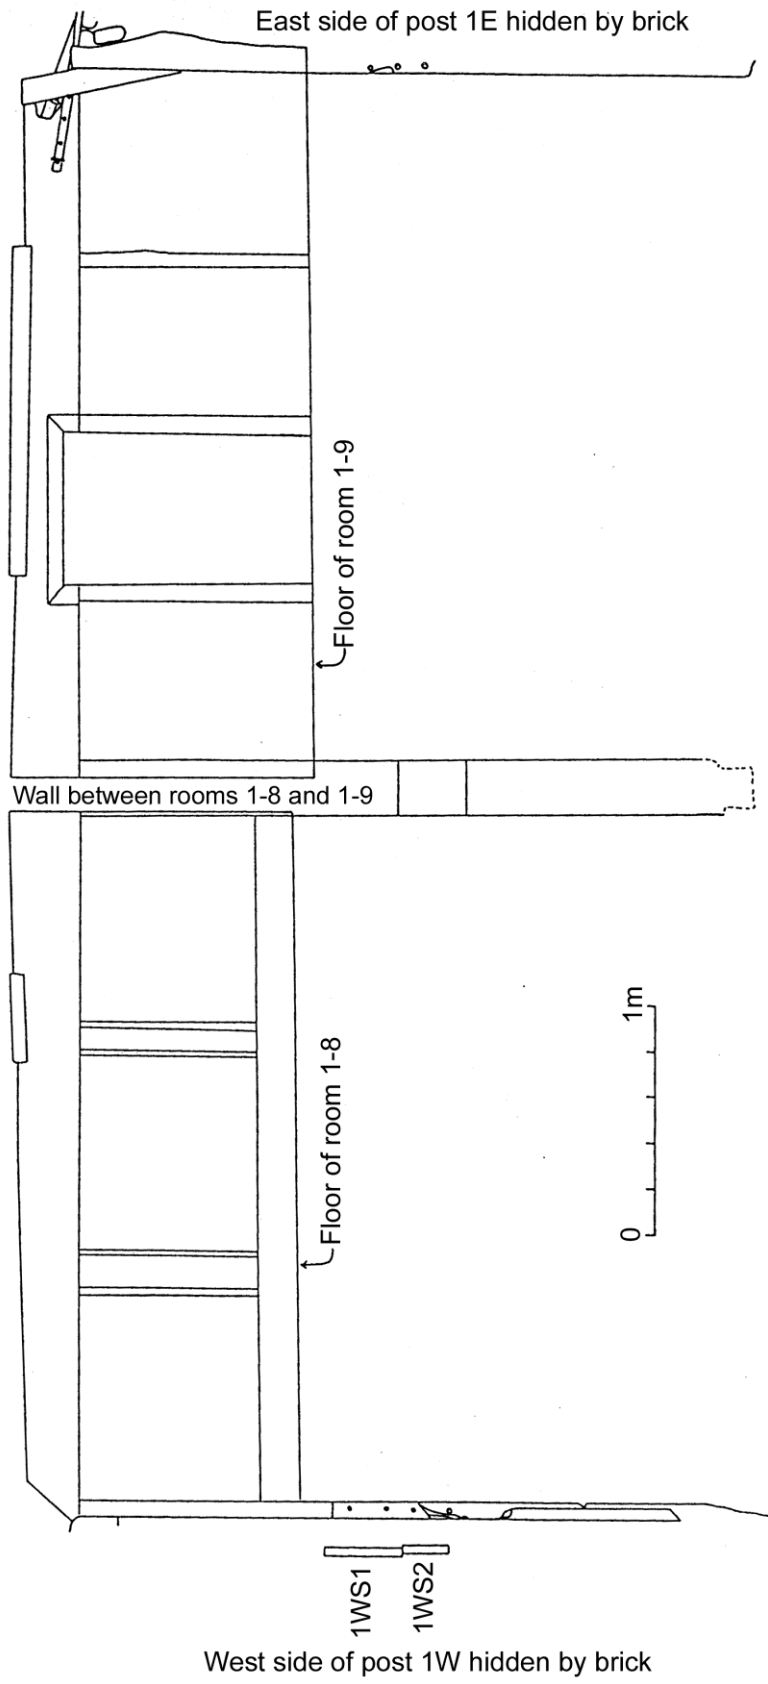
The south side of truss 1 from within the building. Ground floor details not drawn.
